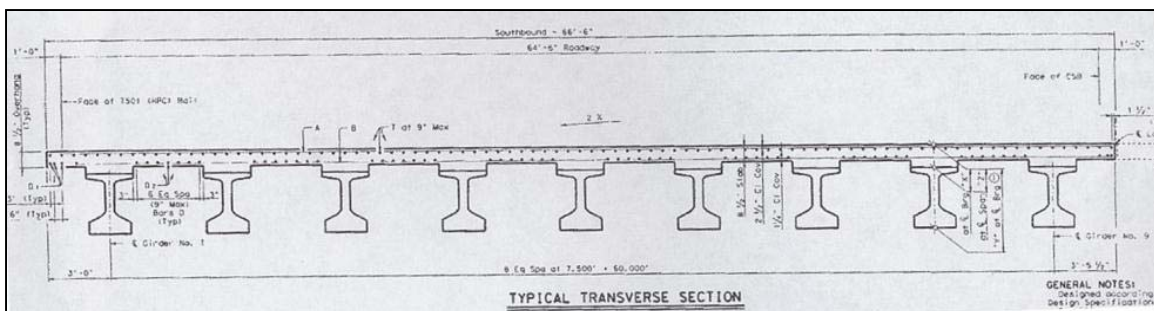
Cross section of Lubbock bridge deck southbound lane.
